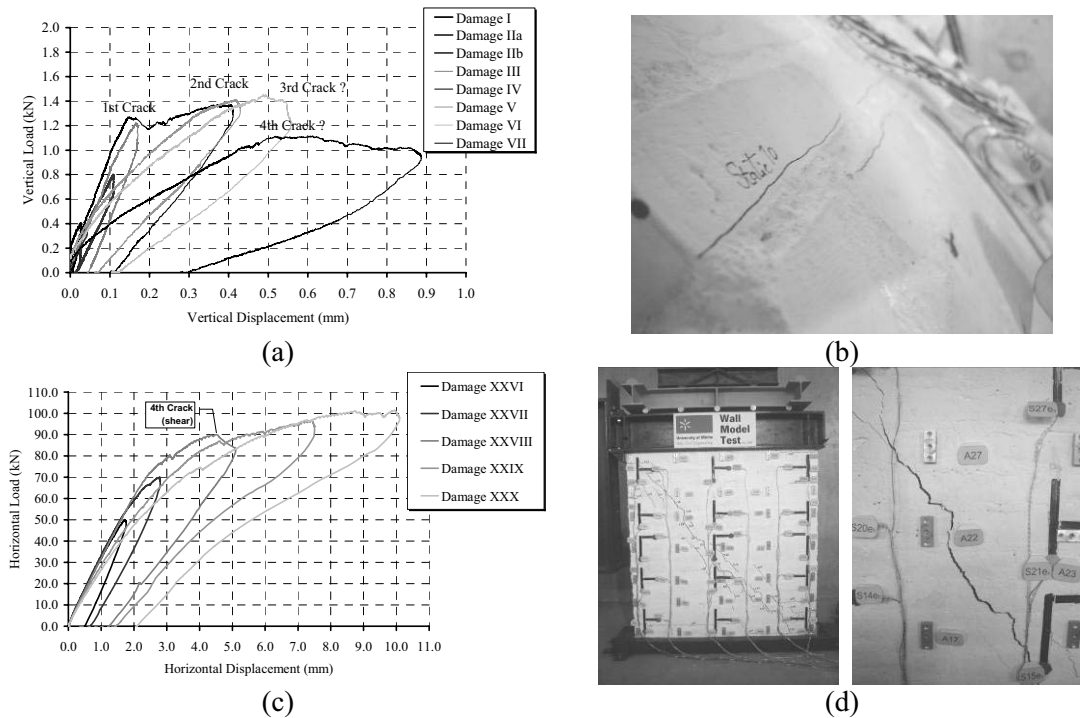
Damage scenarios: (a) static test of the arch; (b) one crack of the arch with 0.05 mm width; (c) static test of the wall; (d) one crack of the wall with 1.20 mm width.
